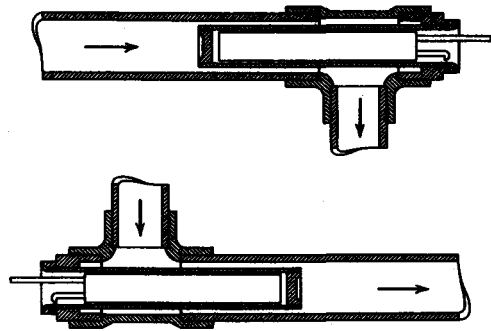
Remote bulb well and suggested piping. (Courtesy Alco Valve Company.)
